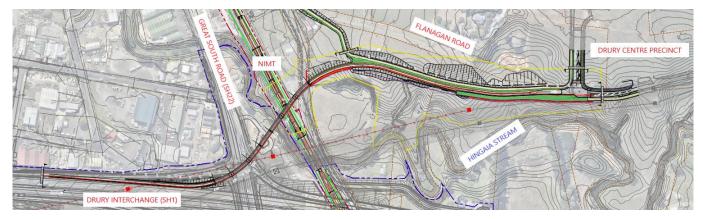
Indicative location plan of the Drury Access Ramp Project
